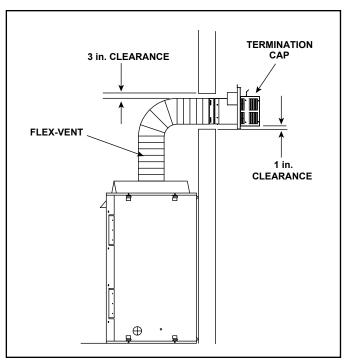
Flex Vent Pipe - Generic Fireplace Shown
